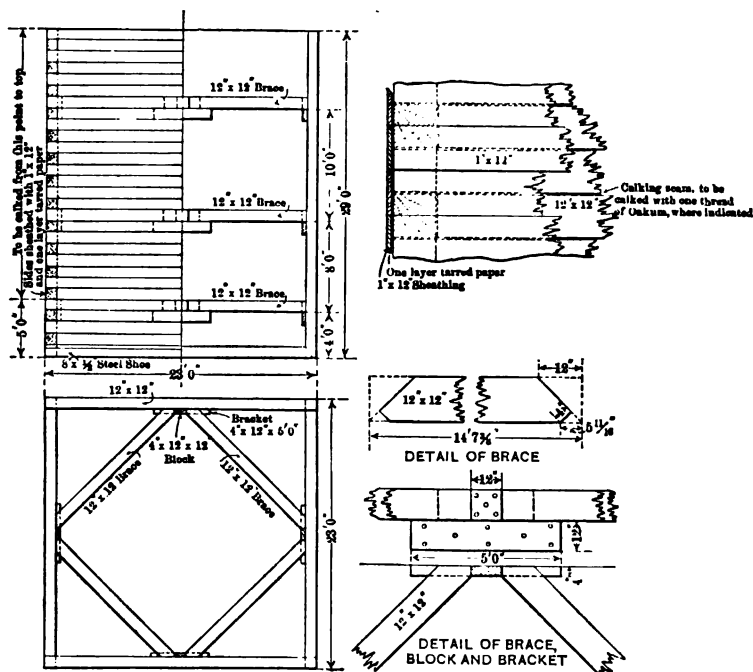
CRIB FOR LULU ISLAND BRIDGE.
